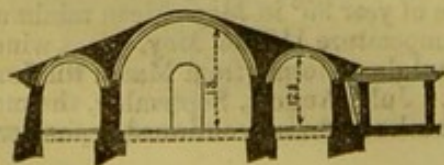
PLAN OF MADRAS ARTILLERY BARRACKS, SECUNDERABAD.
